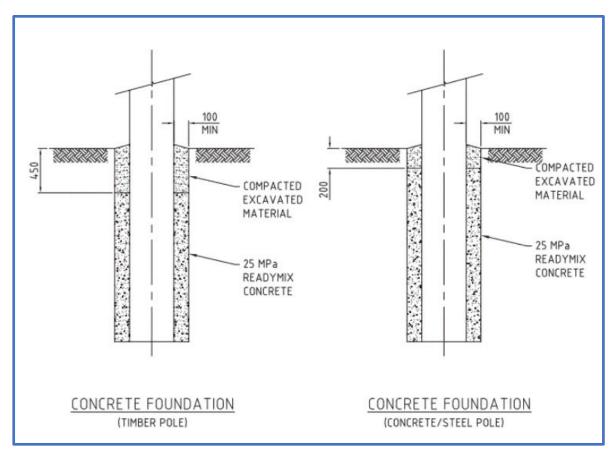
Construction diagrams showing the foundations of timber and steel poles
